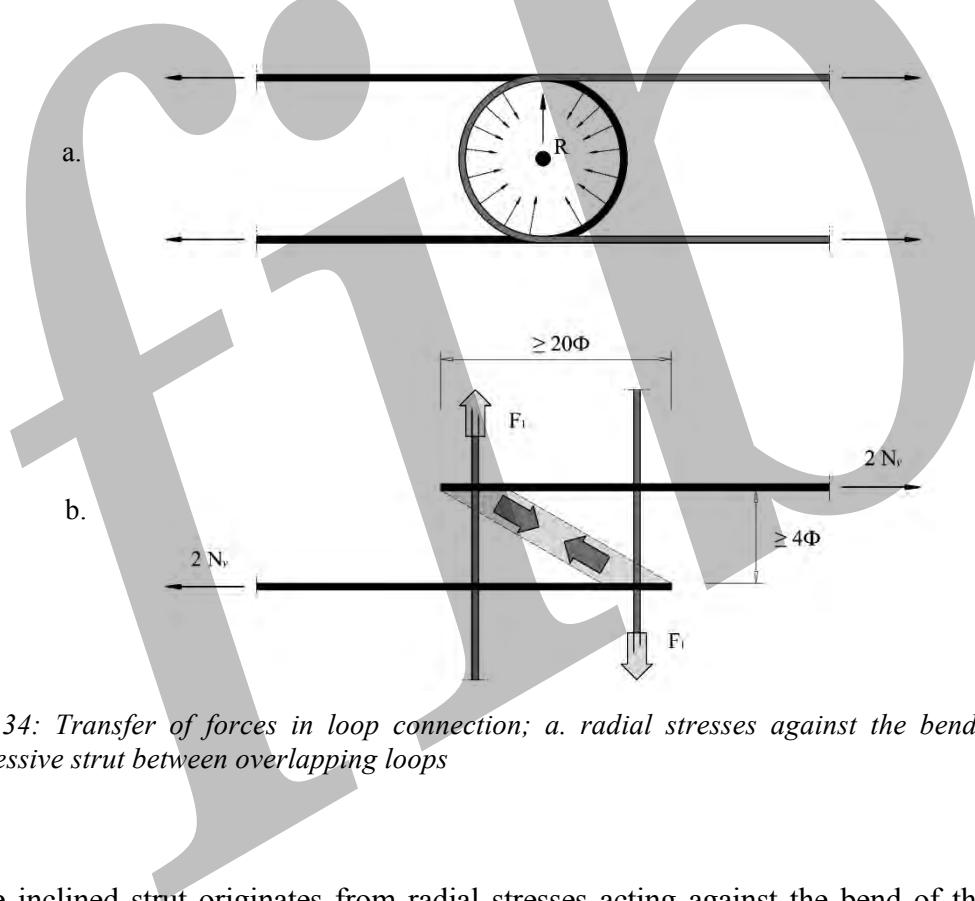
Transfer of forces in loop connection; a. radial stresses against the bend, b. inclined compressive strut between overlapping loops
